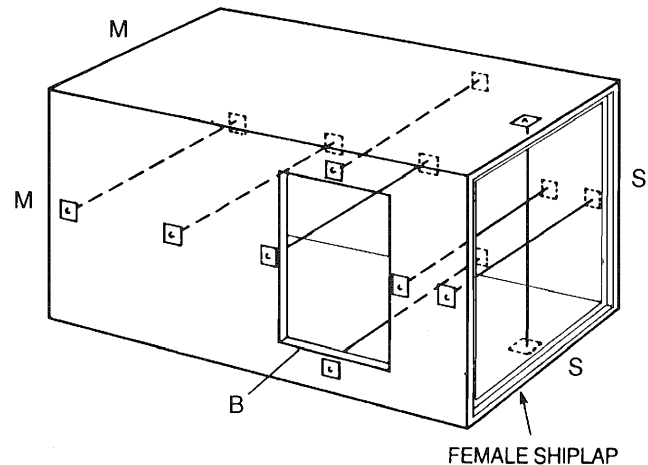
REINFORCEMENT OF ACCESS DOOR FRAMING
